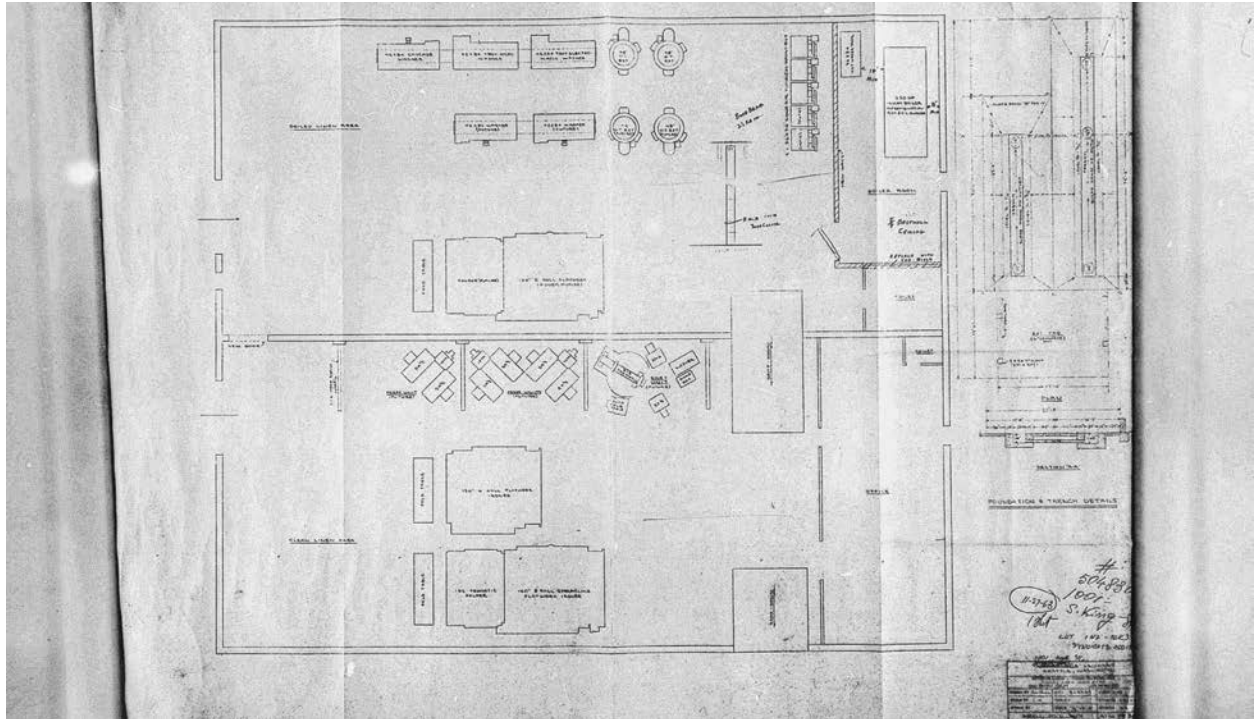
1001-1005 S. King Street Laundry Plans (dated 11/27/1963)
